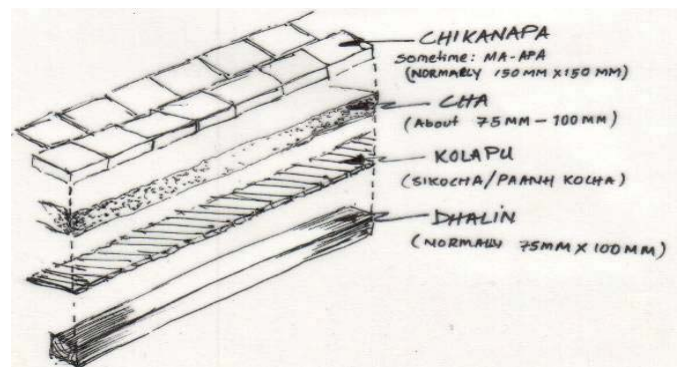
Ba: (Floor) Construction details and design (Author, 2012)
